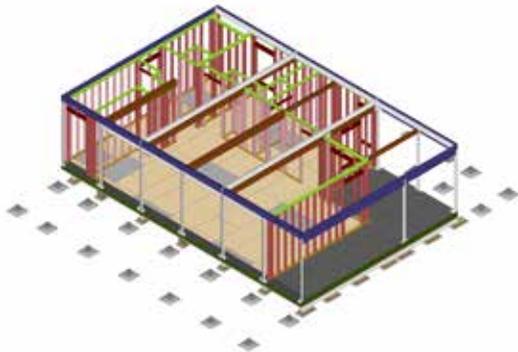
ADDITIONAL PERIMETER BEAMS
